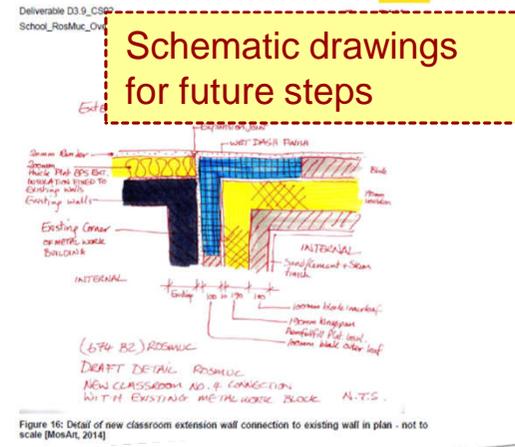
Detail of new classroom extension wall connection to existing wall in plan - not to scale (MosAt, 2014)
